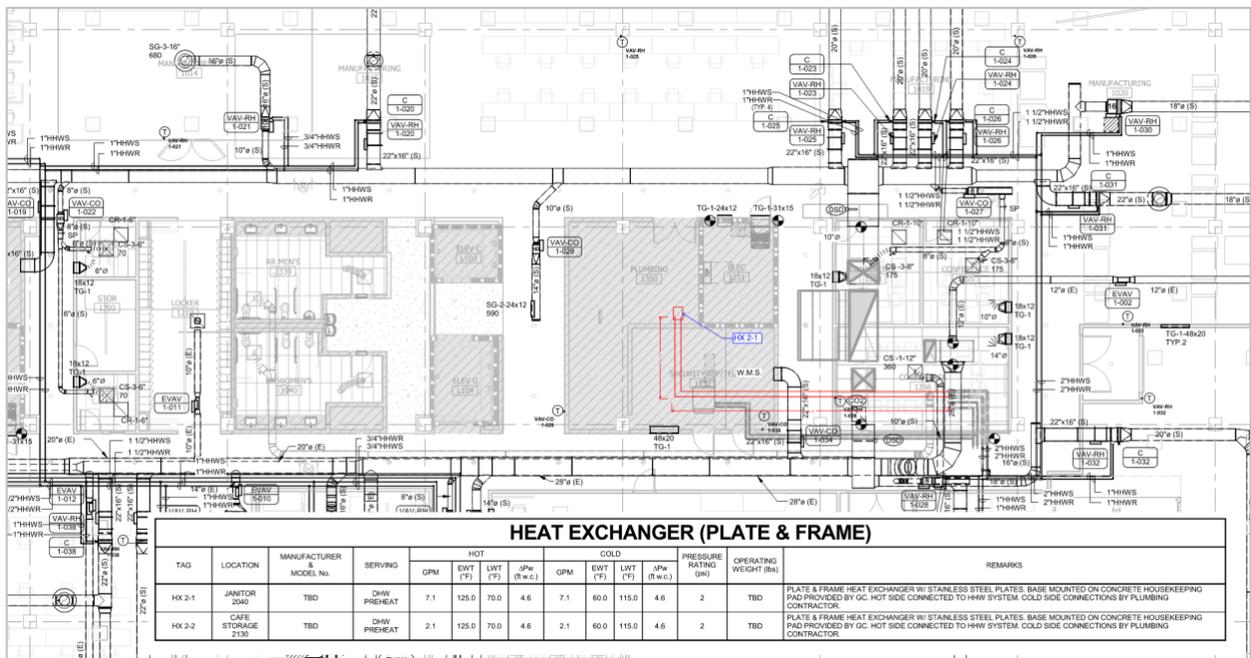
Typical Mechanical Drawings Showing DHW HX Incremental Piping and Equipment Schedule
